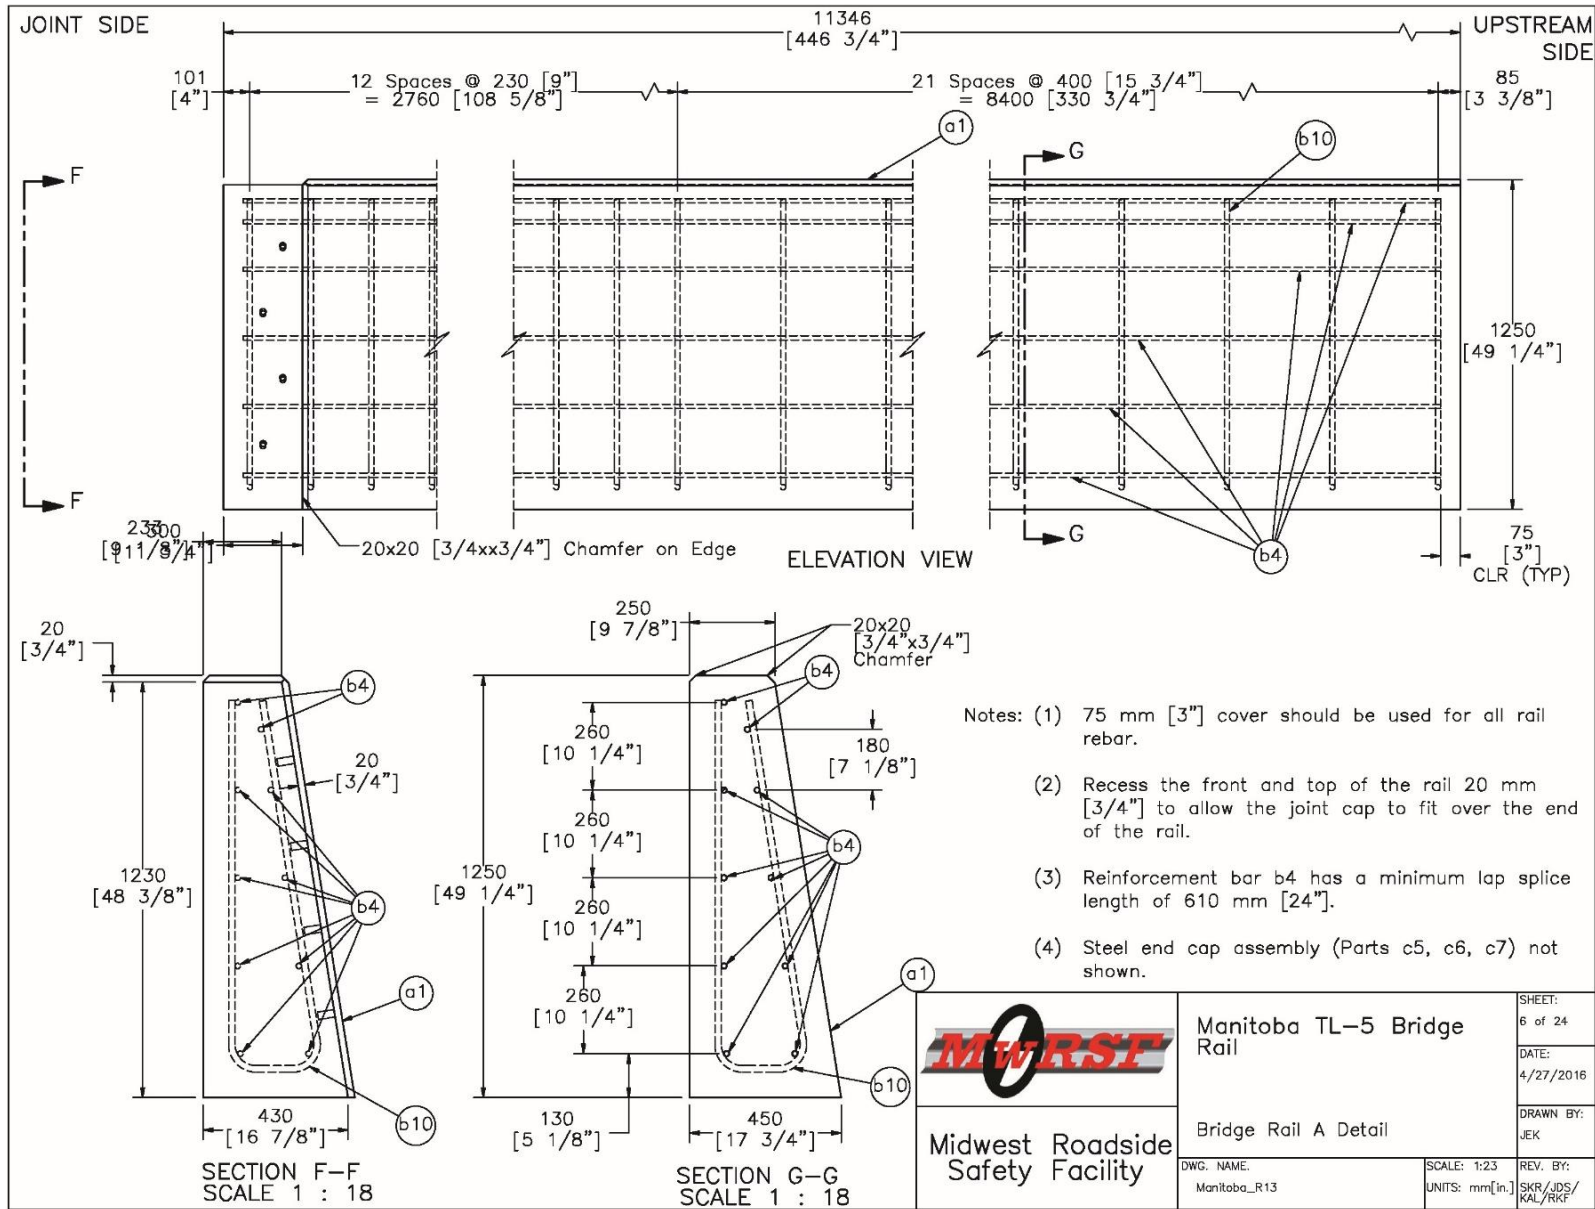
Bridge Rail A Detail, Test No. MAN-1
